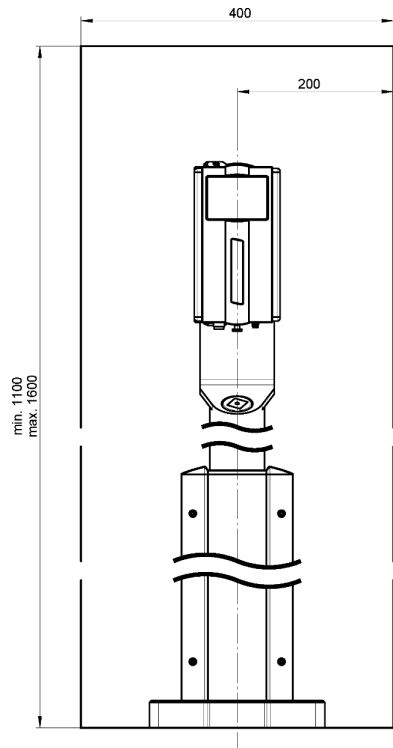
Height and width of a wall niche – installation with floor mount (standard) (dimensions in mm)
